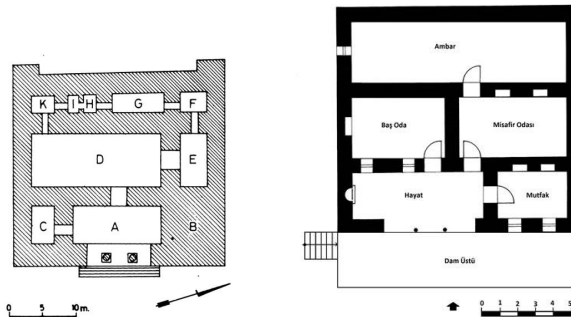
Bithilani Plan Type (URL-3) and the Plan of a House in the Kahta Region of Adıyaman Today (Eraslan, 2013).
